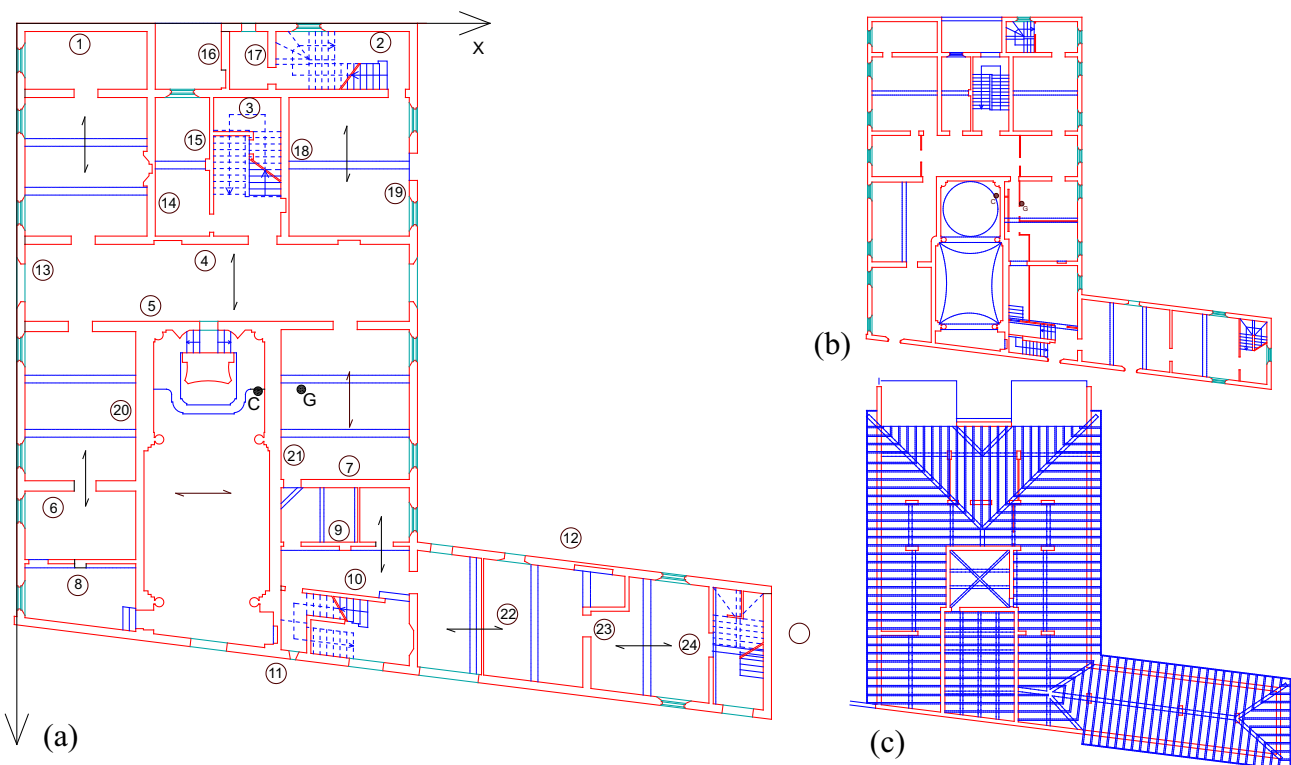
Ground (a), first (b) and roof (c) floors of the investigated masonry building.
